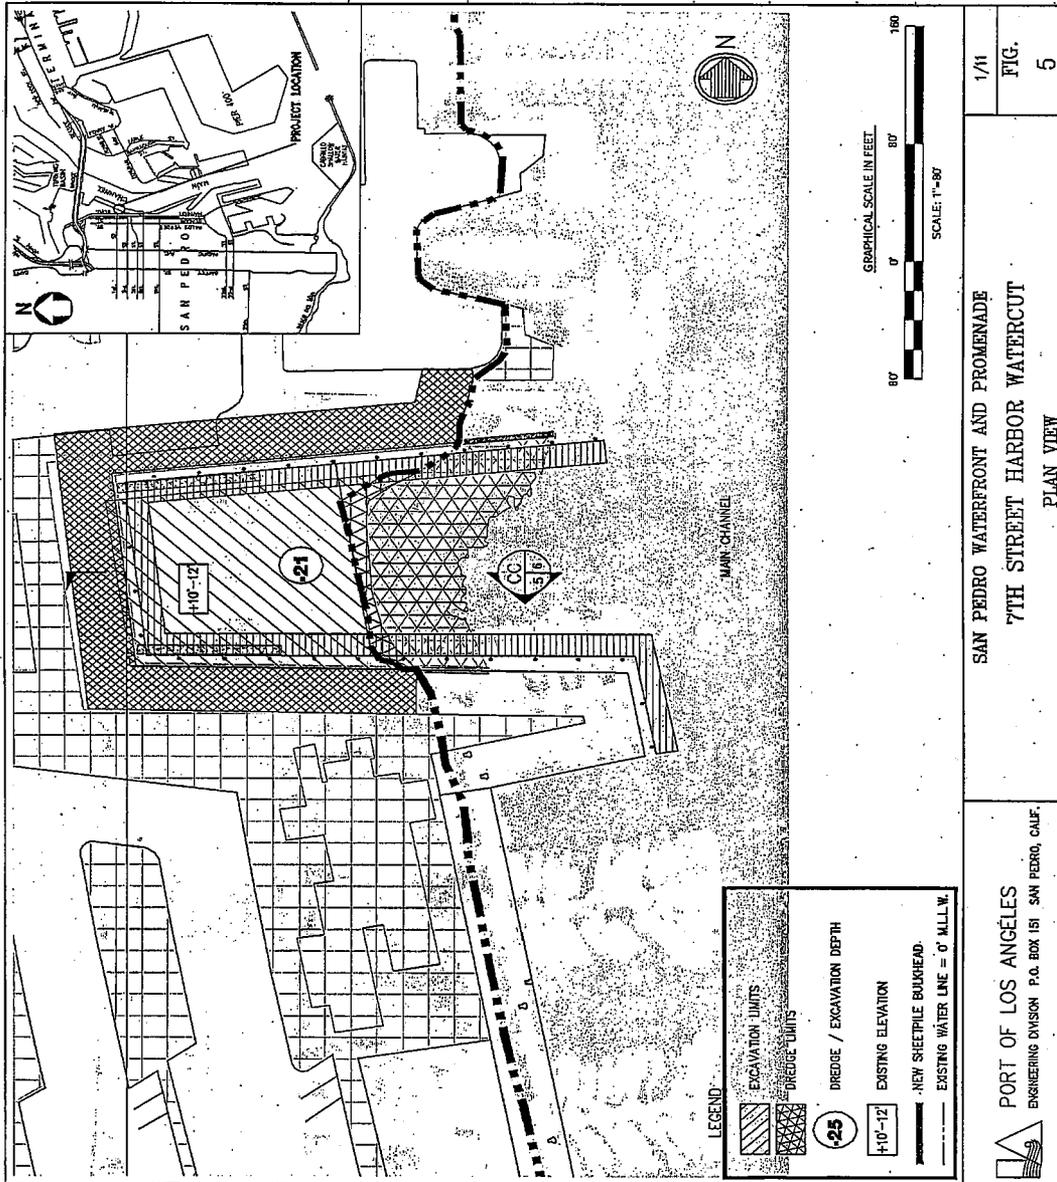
San Pedro Waterfront Project – Areas to be Dredged and Excavated Within the 7th Street Watercut.
